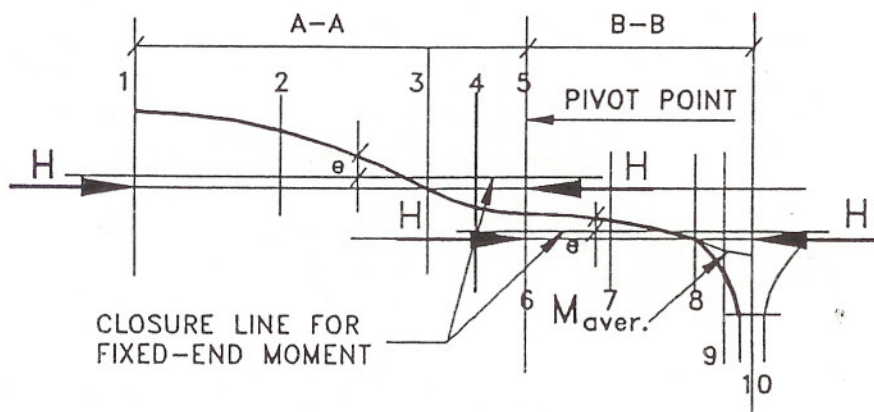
Developed Longitudinal Section for Hexagonal Layout
